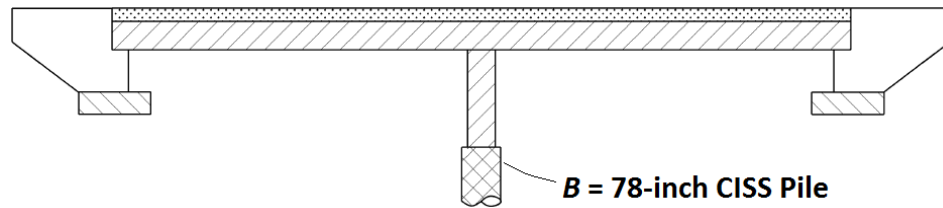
Longitudinal elevation view of proposed Linden Street overcrossing replacement (after Caltrans 2016).
